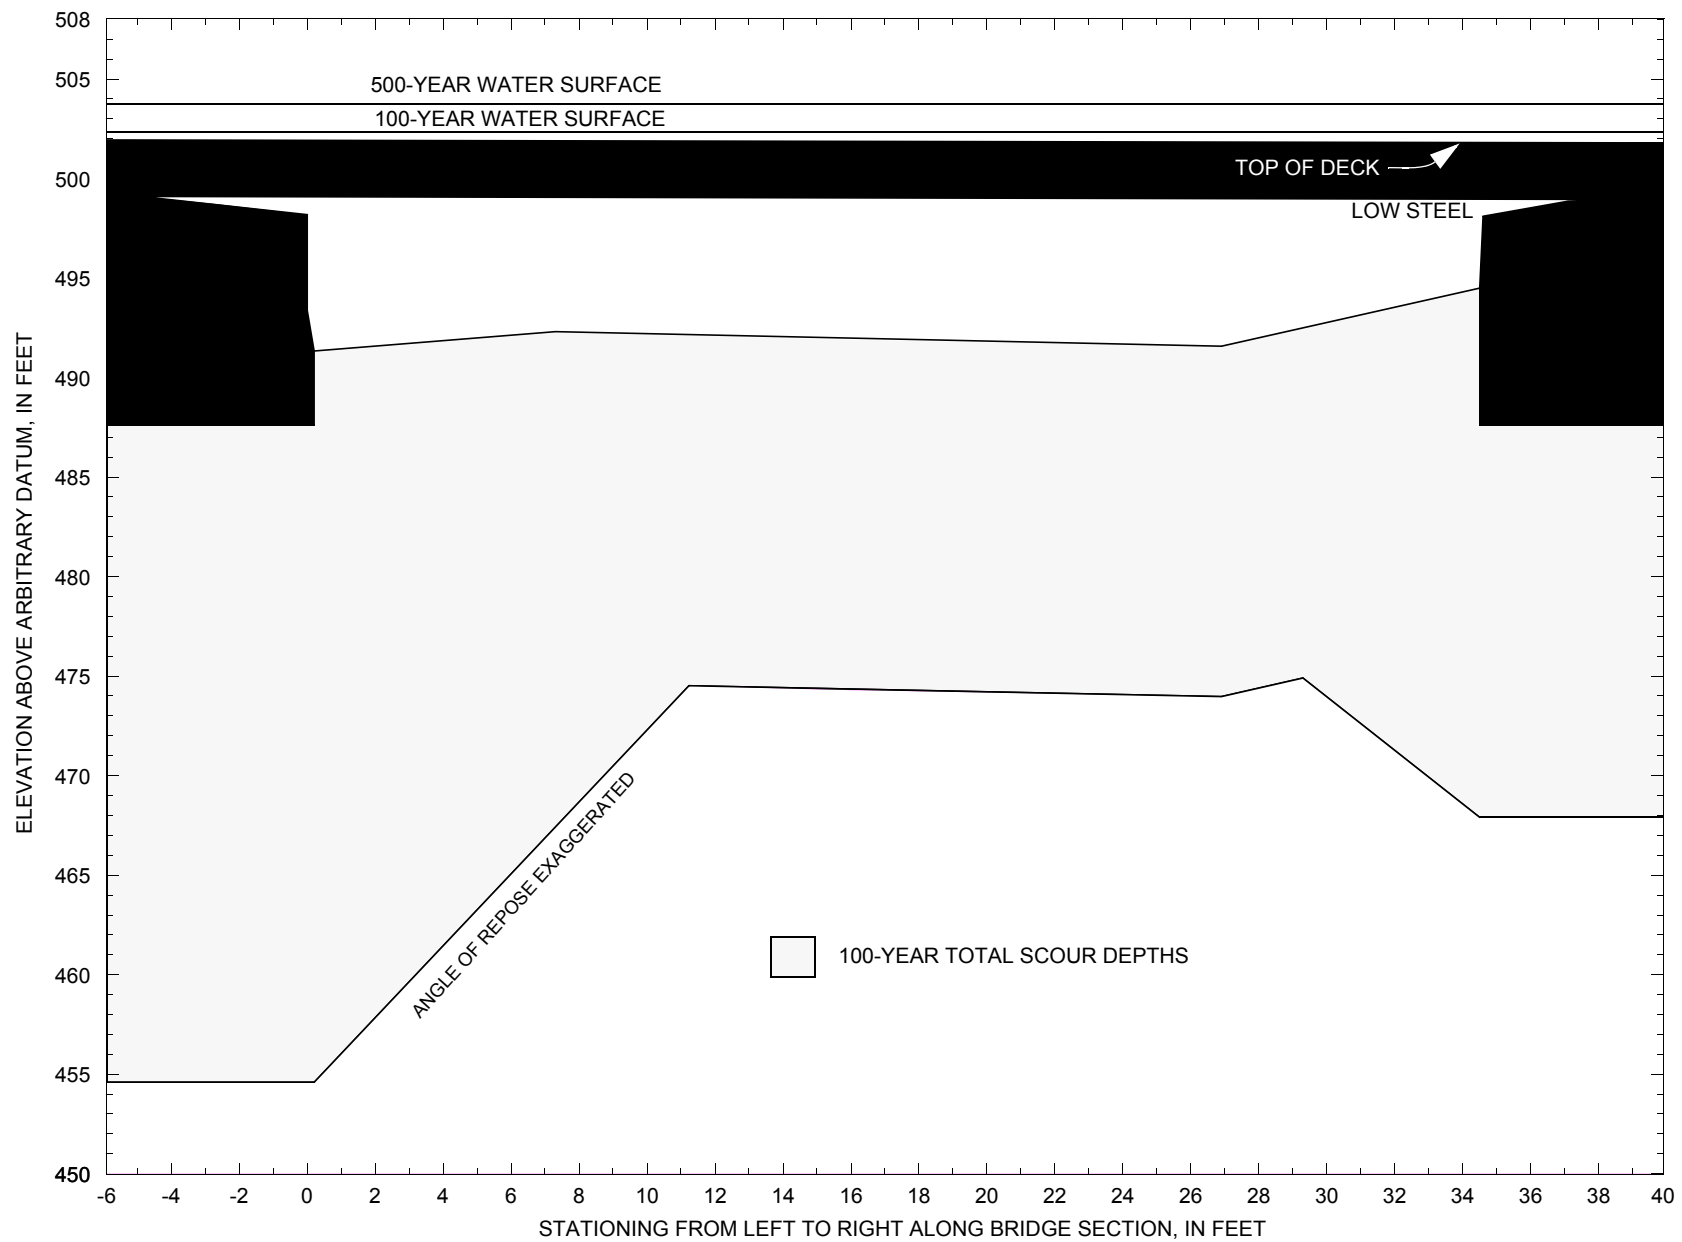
Scour elevations for the 100- and 500-year discharges at structure STOWTH0CEM0071 on Cemetery Road, crossing the Little River, Stowe, Vermont.
